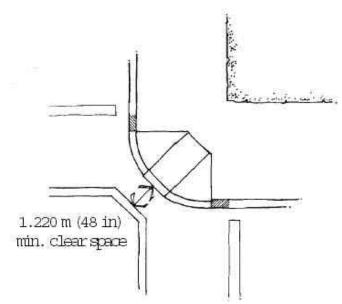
If diagonal curb ramps are installed, a 1.220-m (48-in) clear space should be provided to allow wheelchair users enough room to maneuver into the crosswalk.
